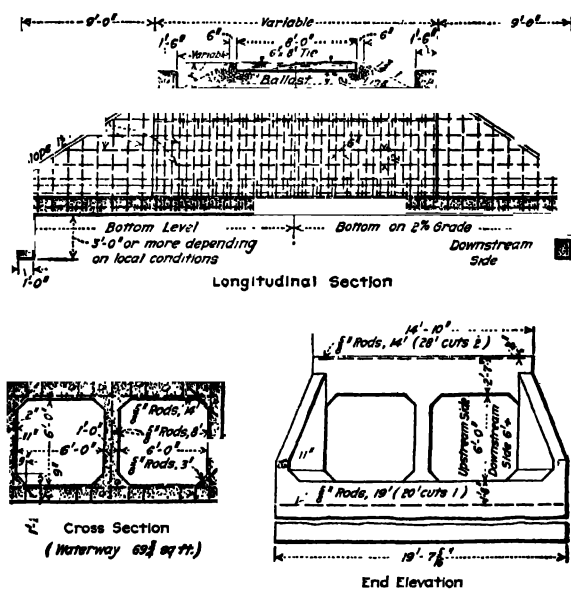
Double 6 x 6-ft. culvert, A. T. & S. Fe. Ry. system.
